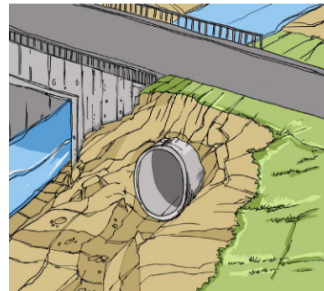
Building a relief opening can help prevent flooding of bridges.
